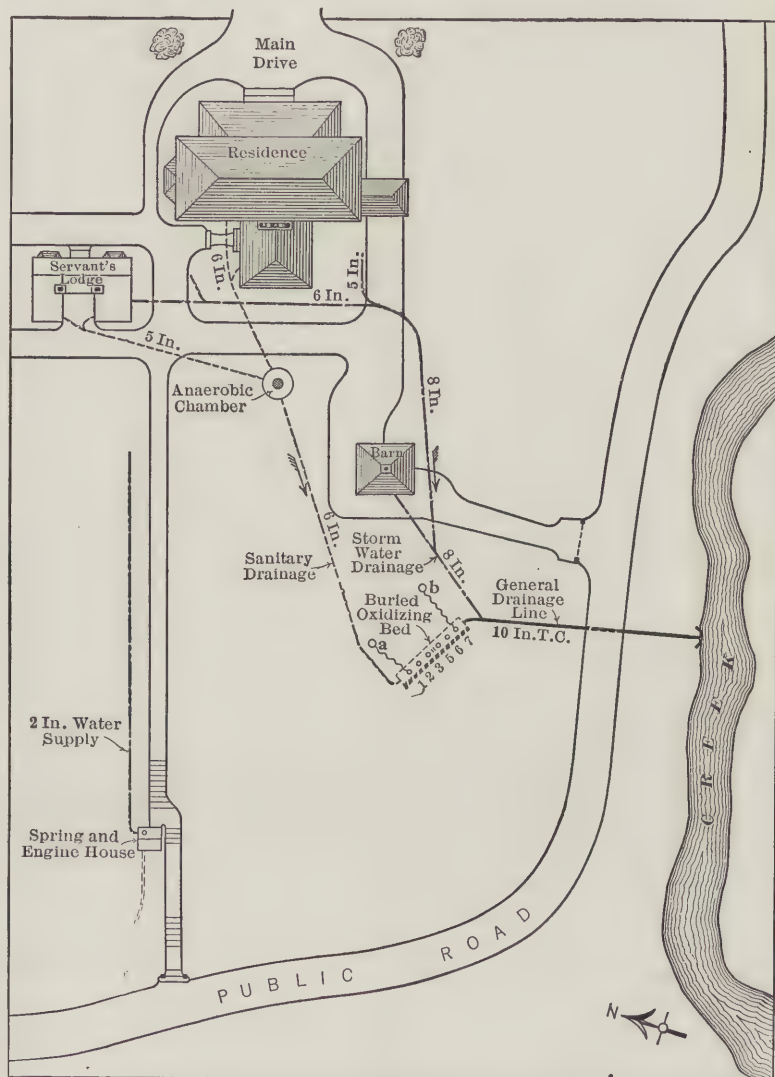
SUBURBAN RESIDENCE DRAINAGE SYSTEM WITH SEPTIC ARRANGEMENT FOR THE SANITARY OUTFALL
